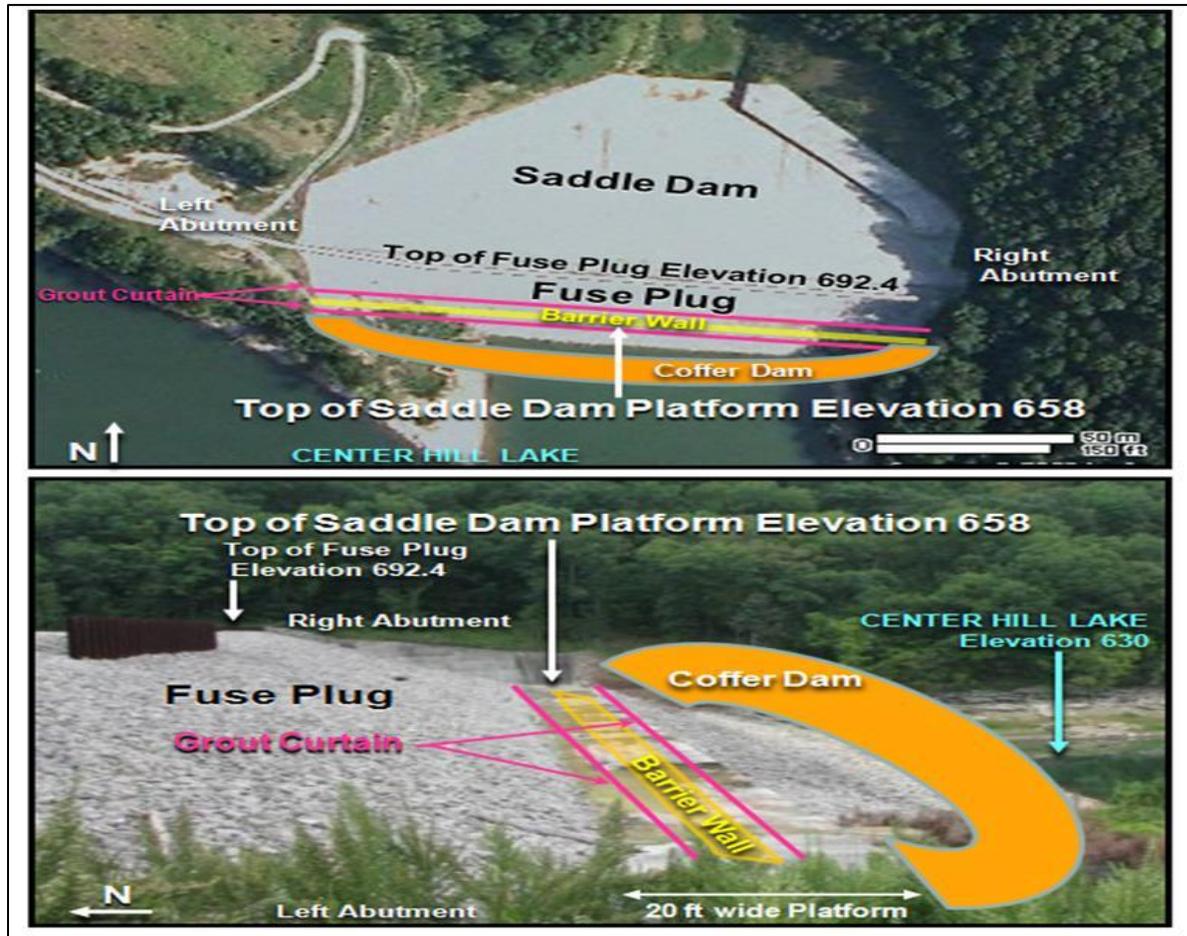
Previously Approved Saddle Dam Plan – Grout Curtains, Barrier Wall, and Coffer Dam.
